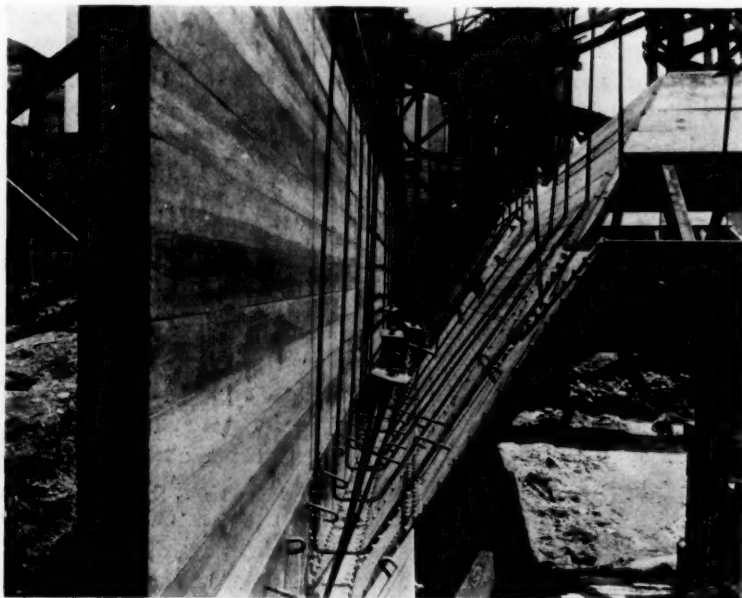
SHOE AND REINFORCEMENT OF CUTTING EDGE OF THE CAISSON
